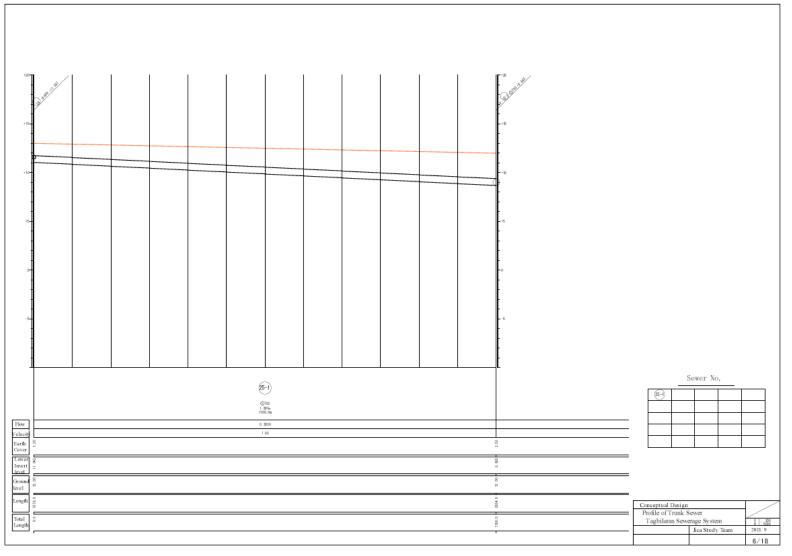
Profile of Trunk Sewer (Tagbilaran Sewerage System)
